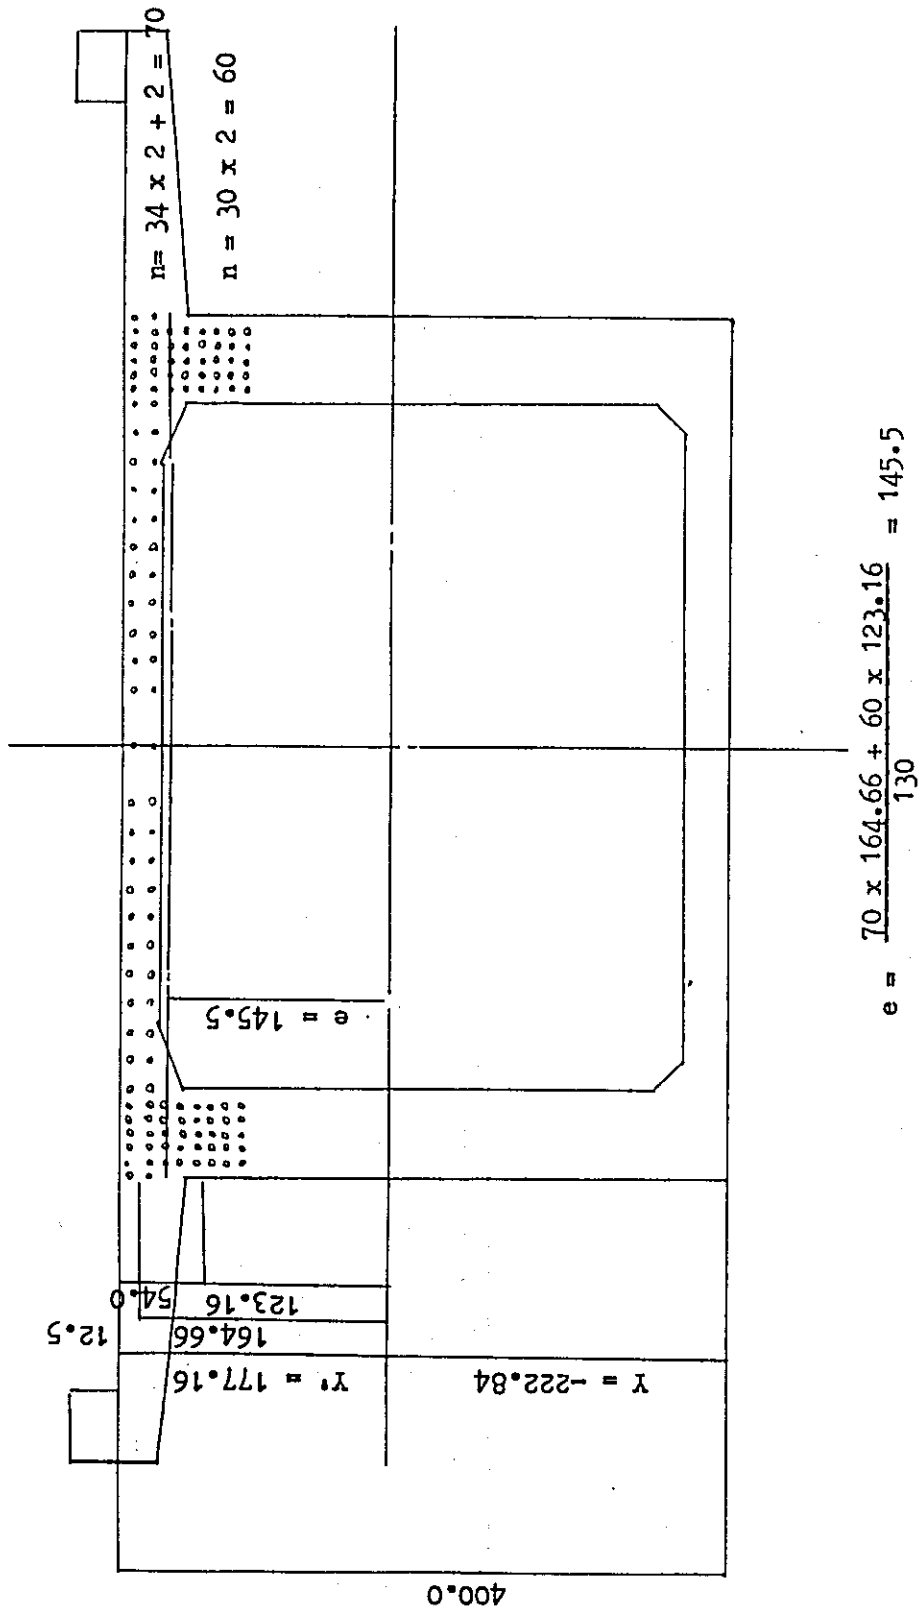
LOCATION OF PRESTRESSED BARS
